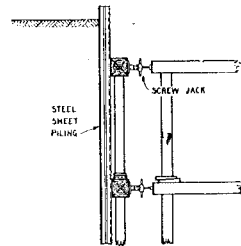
COFFERDAM BRACING WITH SCREW JACKS.
